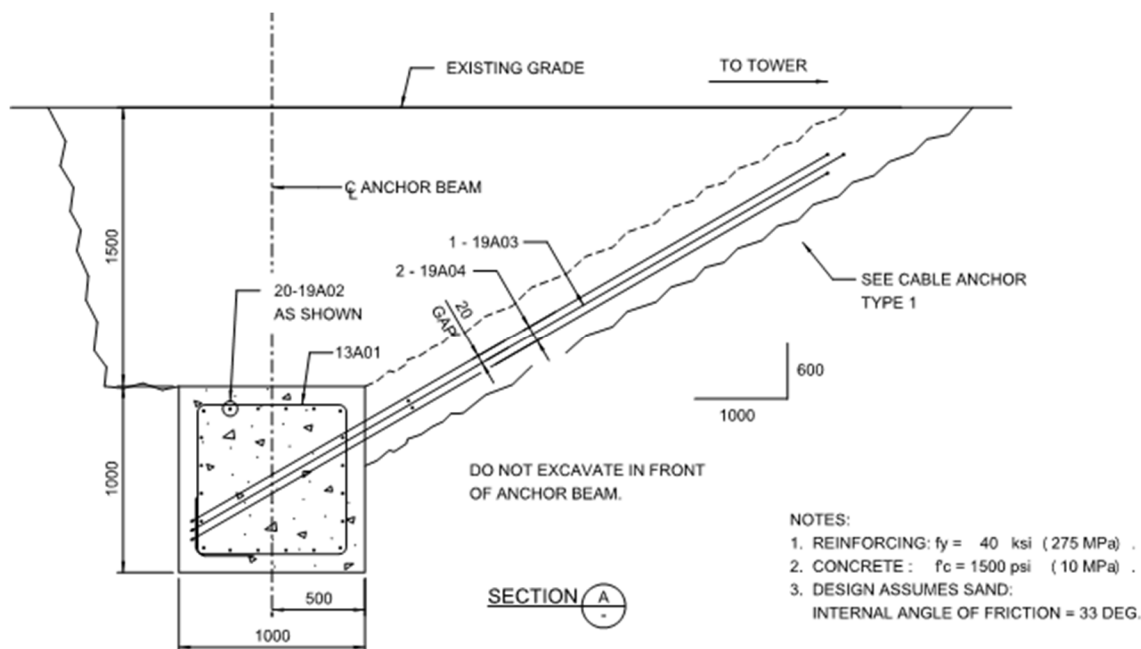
Typical Anchor/Transition Arm Construction Detail (Bridges to Prosperity, 2016).
